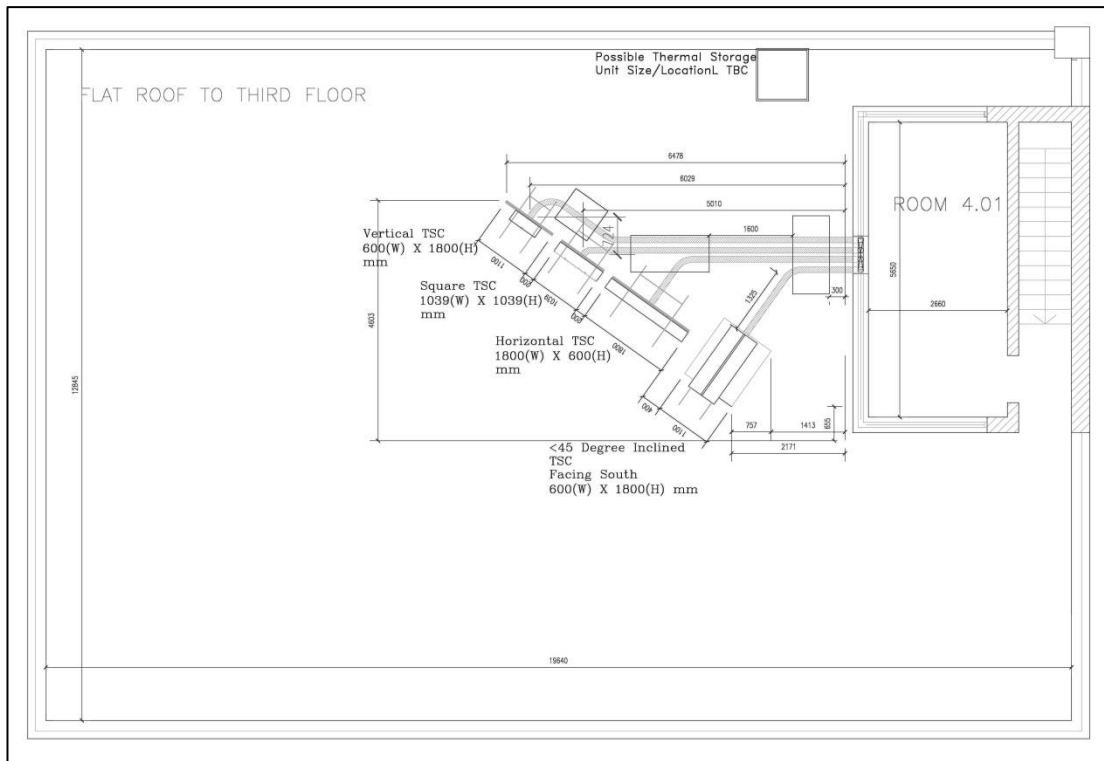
Layout of the TSC installations on the roof, all panels are facing south
